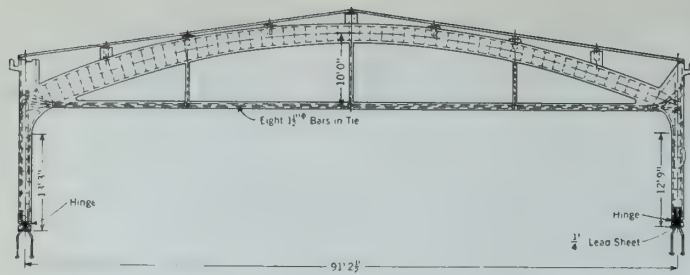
Tied arch of reinforced concrete for shed erected on wharf.
